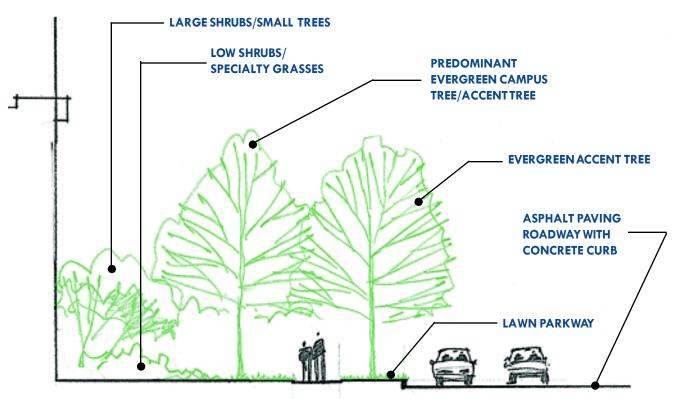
E ILLUSTRATIVE LANDSCAPE SECTION—CAMPUS CIRCULATION ROADWAY
